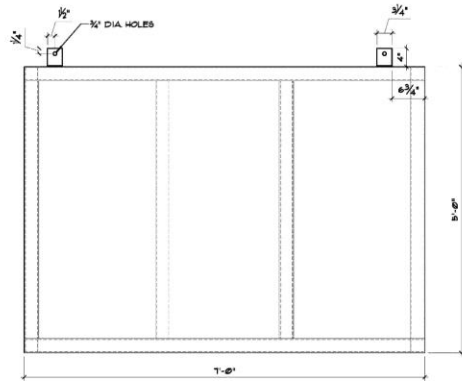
PONTOON "D" FRAMING DETAILS
